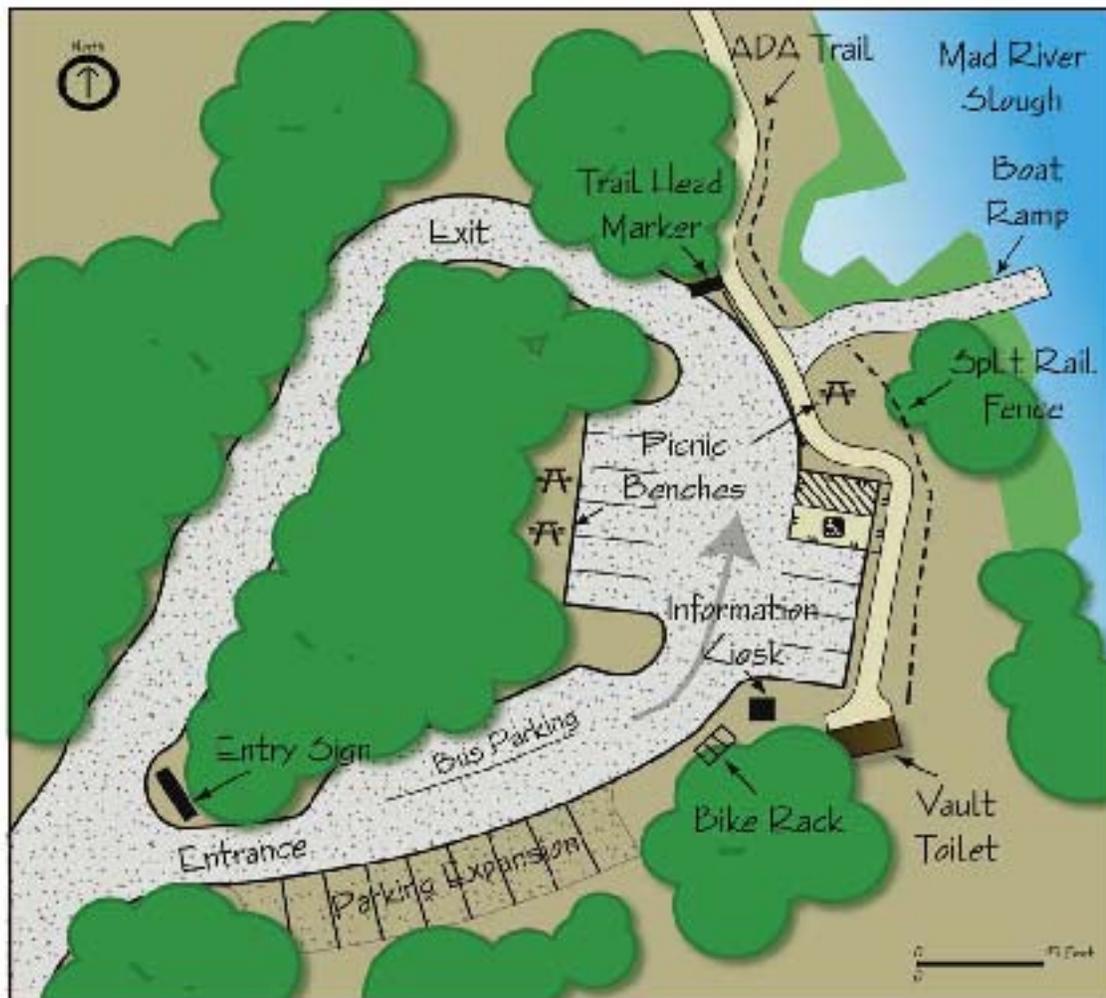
Proposed layout of the Ma-le'l North Parking Area
